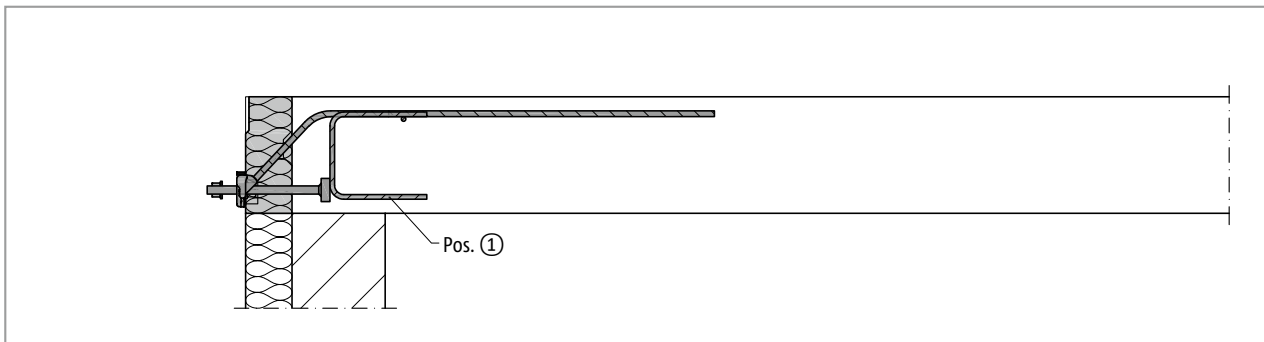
Schöck Isokorb® T type SQ: On-site reinforcement: Cross section
